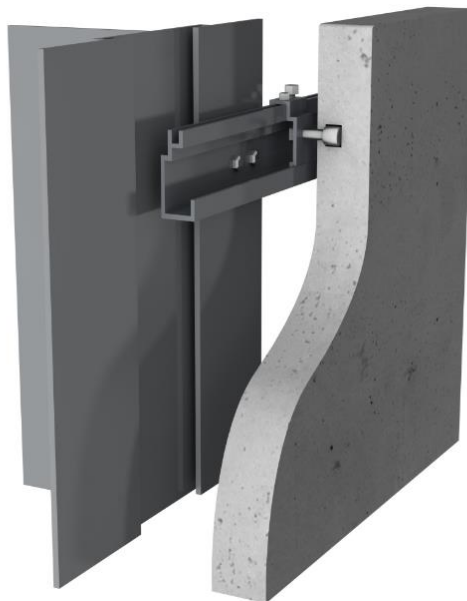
Invisible mounting system - with the use of a back-expanding sleeve
